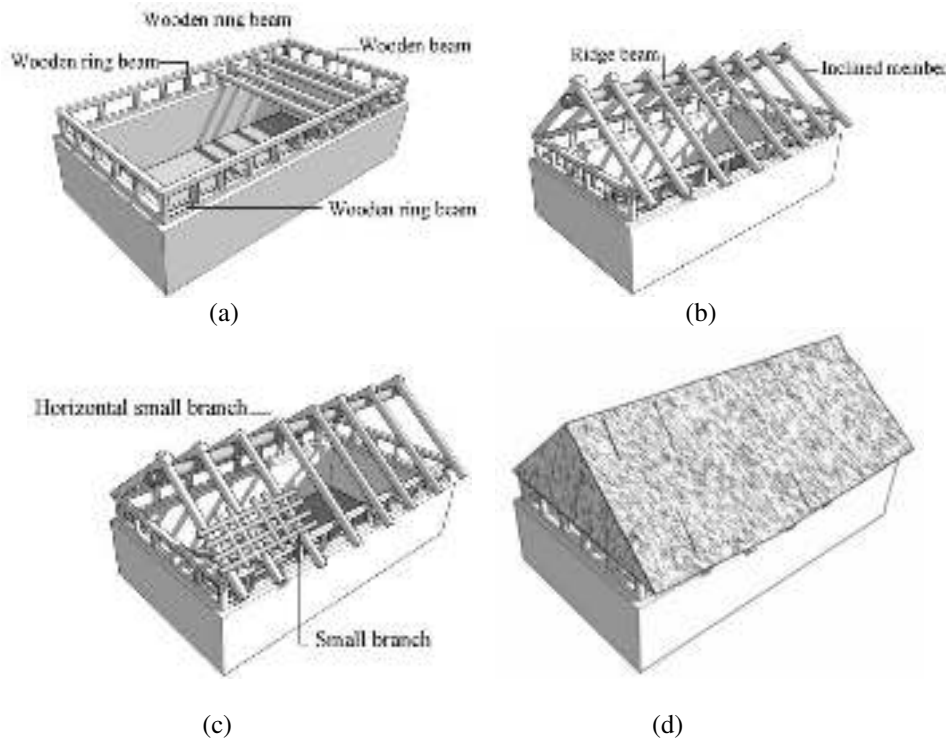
A *galipush* roof: (a) ring beam, (b) inclined elements of the truss, (c) small branches connecting the inclined members of the truss, (d) reed stems covering the truss
